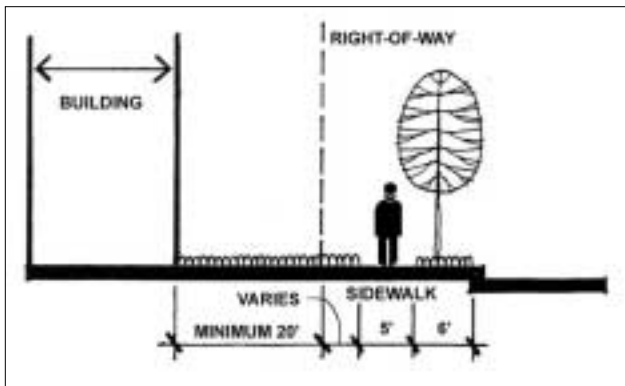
CE setback and building placement will make buildings more prominent by reducing the distance from the edge of the road.
